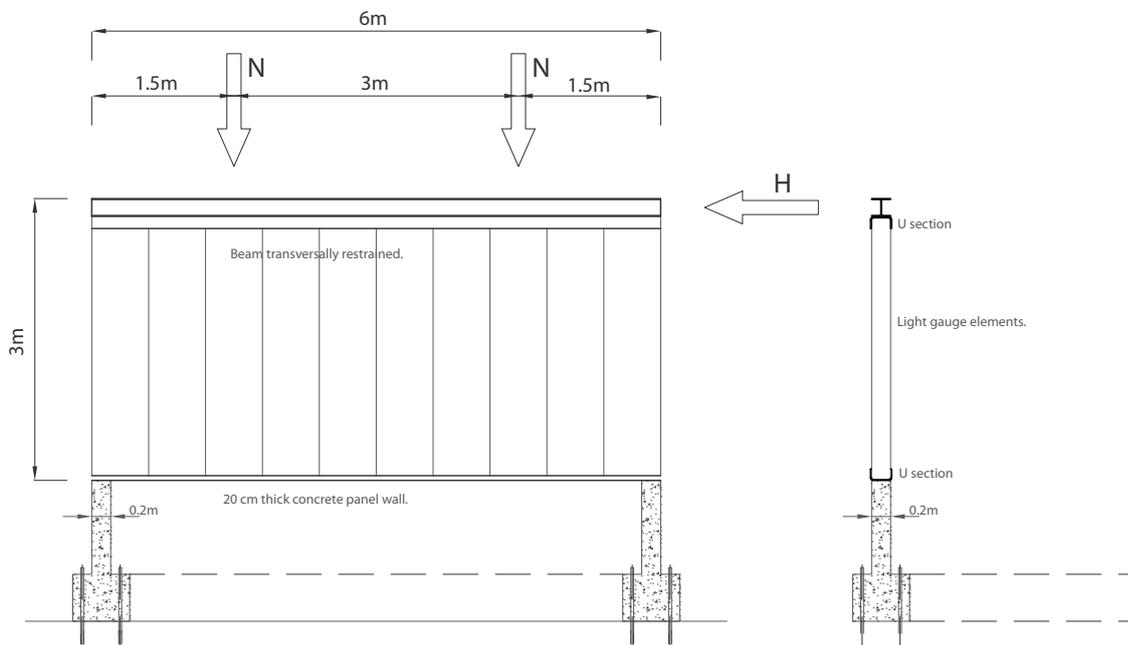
Possible arrangement for testing longitudinal fabricated wall (ArcelorMittal or PRZ) *Forgotten in October
